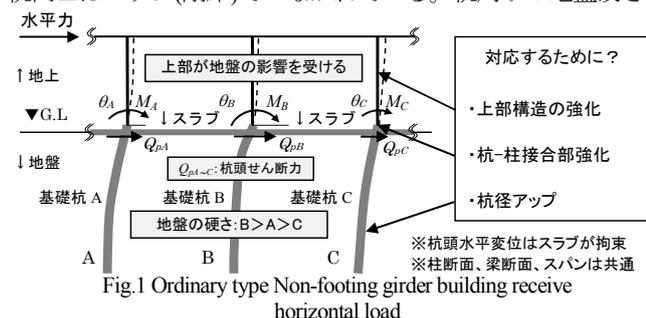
Ordinary type Non-footing girder building receive horizontal load
